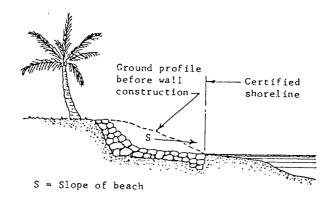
'Typical beachwall section (after Hayashi, 1986)
